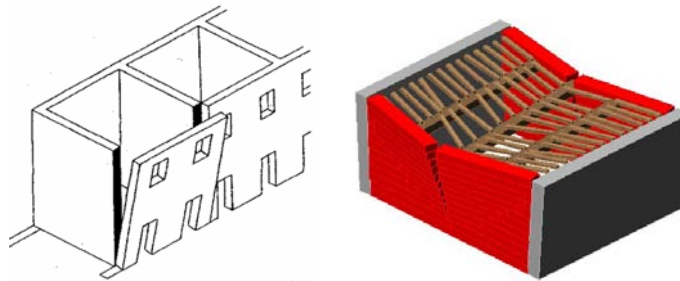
Collapse modes of masonry walls: overturning (left) and horizontal flexure (right).
